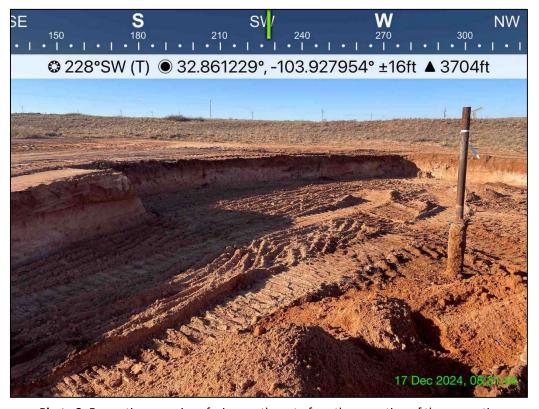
Excavation overview, facing southwest of southern portion of the excavation
